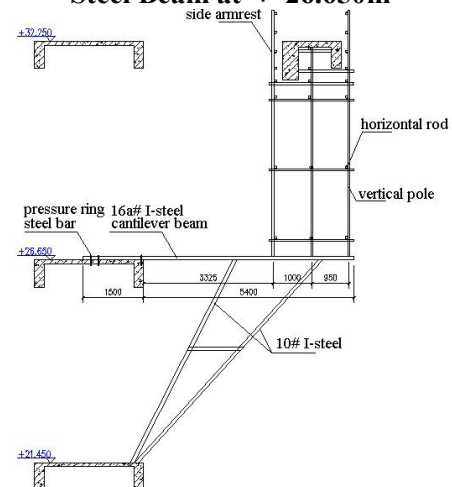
Cantilever Formwork Erection Section (Cantilever Type)
